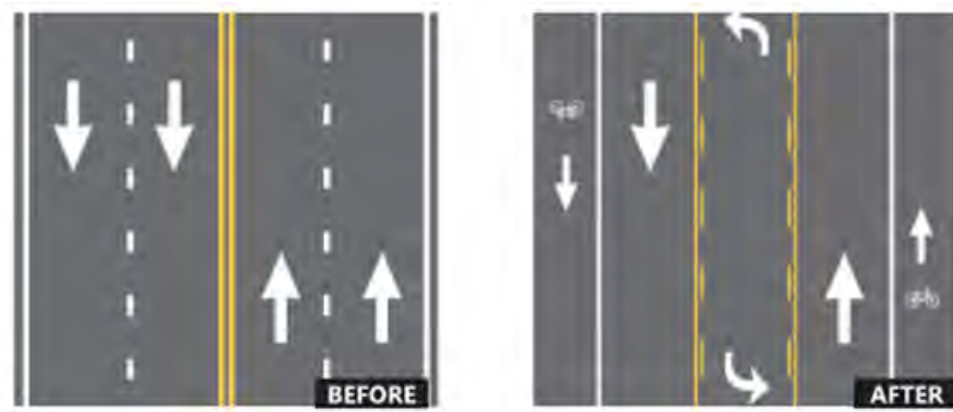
Road Diet Example Diagram (Source: FHWA)
